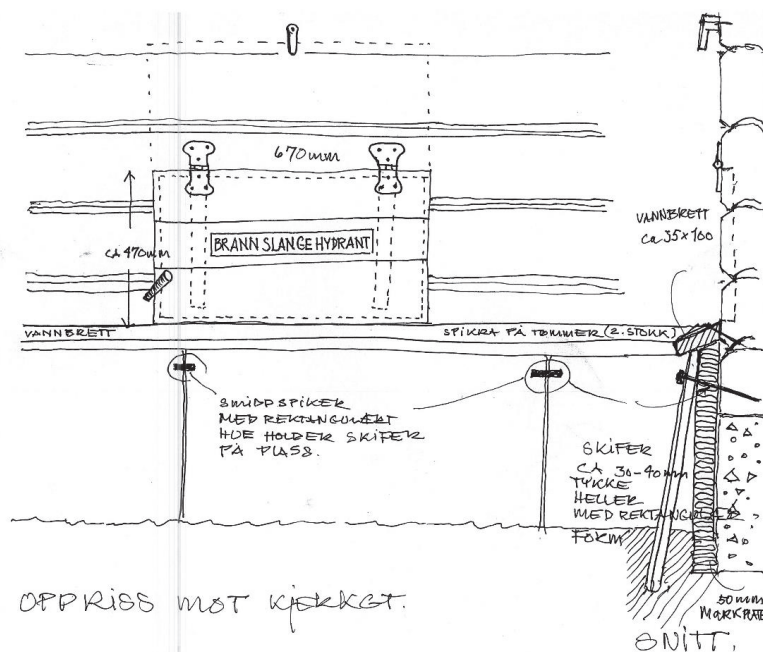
The traditional stone slates, hiding the concrete foundations of the new outbuilding at Kaffestuggugård (Drawing by a local architect, 2008, The private archive of the carpenter).
